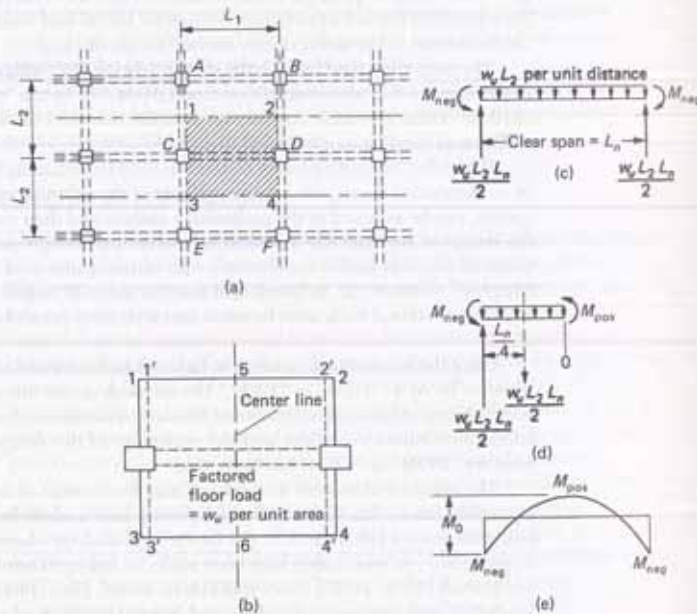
Statics of a typical interior panel in a two-way floor system.
